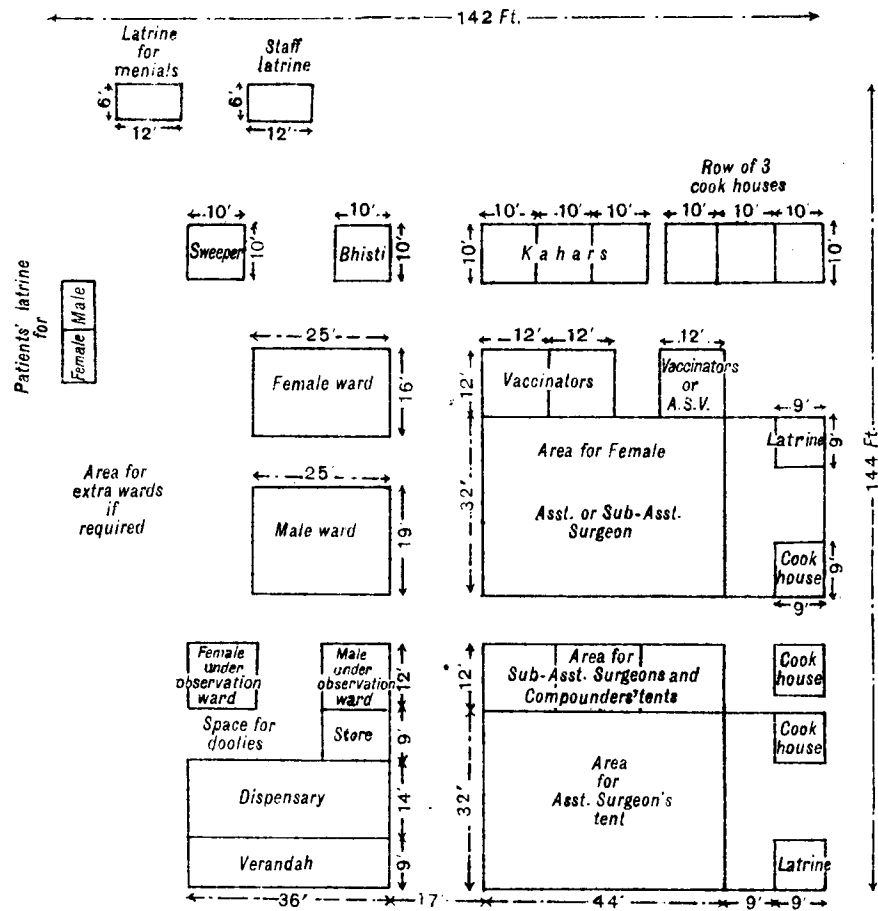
SITE PLAN OF HOSPITAL FOR IMPORTANT FAIRS IN THE UNITED PROVINCES.
